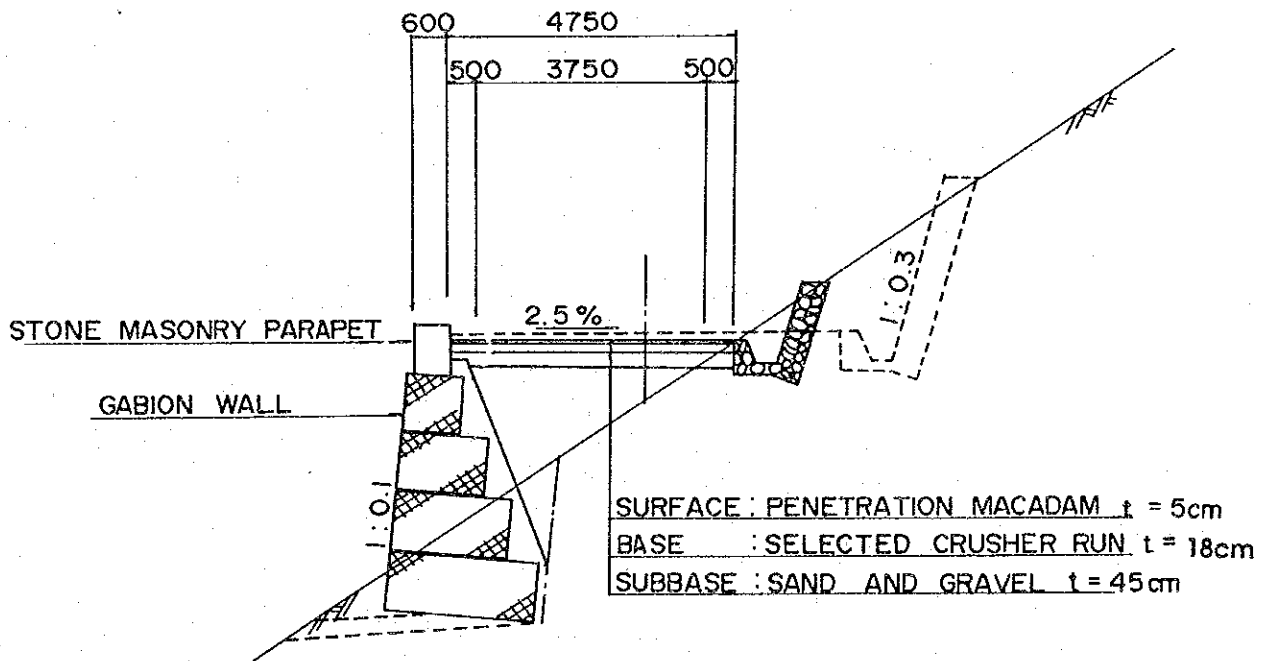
Typical Cross-section for Section II (Normal Case)
